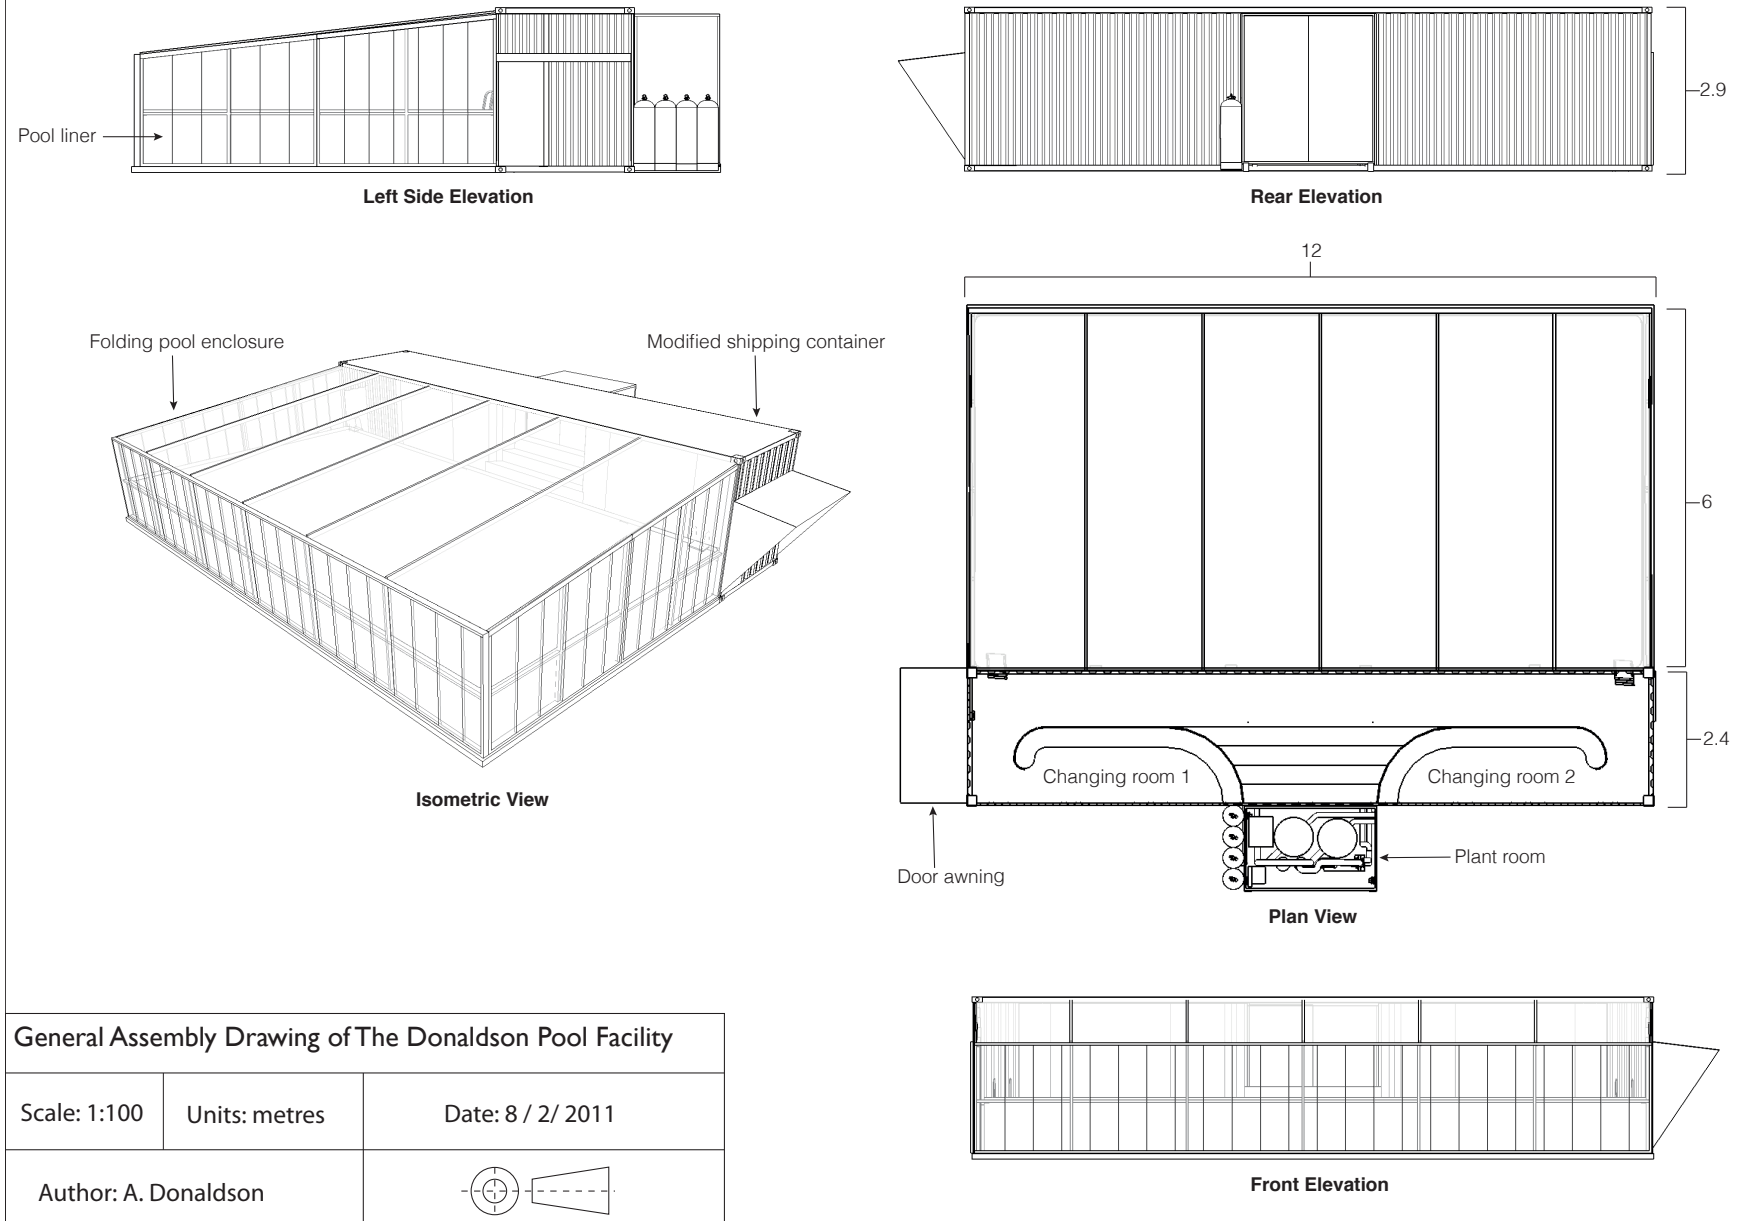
TGeneral assembly drawing of the Donaldson pool.
